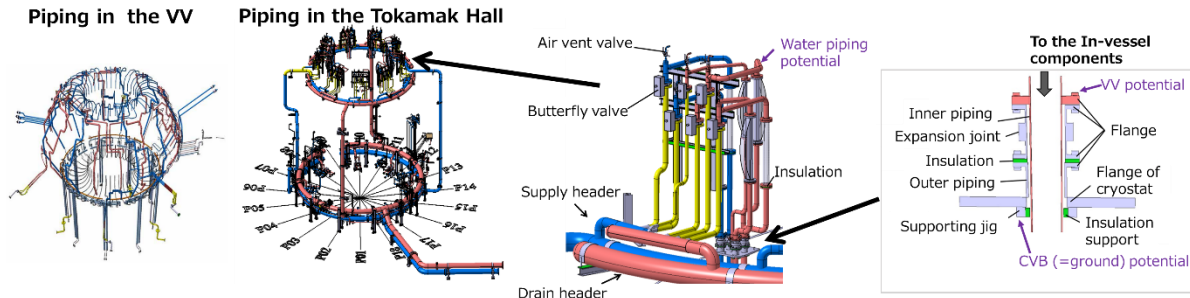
Bird's eyes view and design of cooling water piping in the Tokamak-hall
